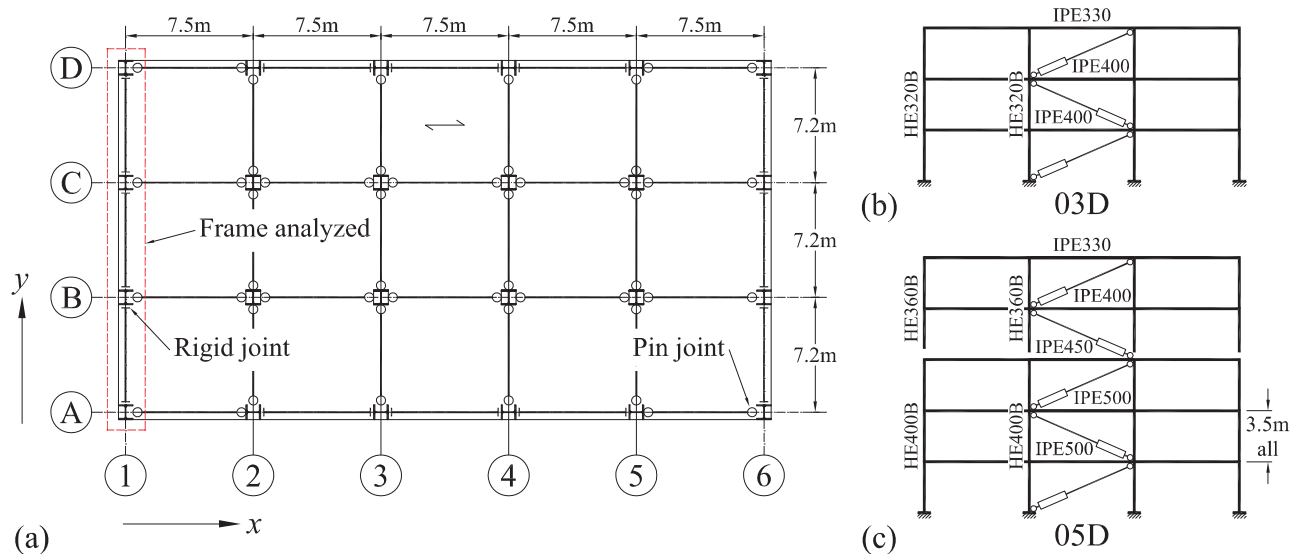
Frame definition; (a) plan layout; (b) elevation of frame 03D2; (c) elevation of frame 05D2.
